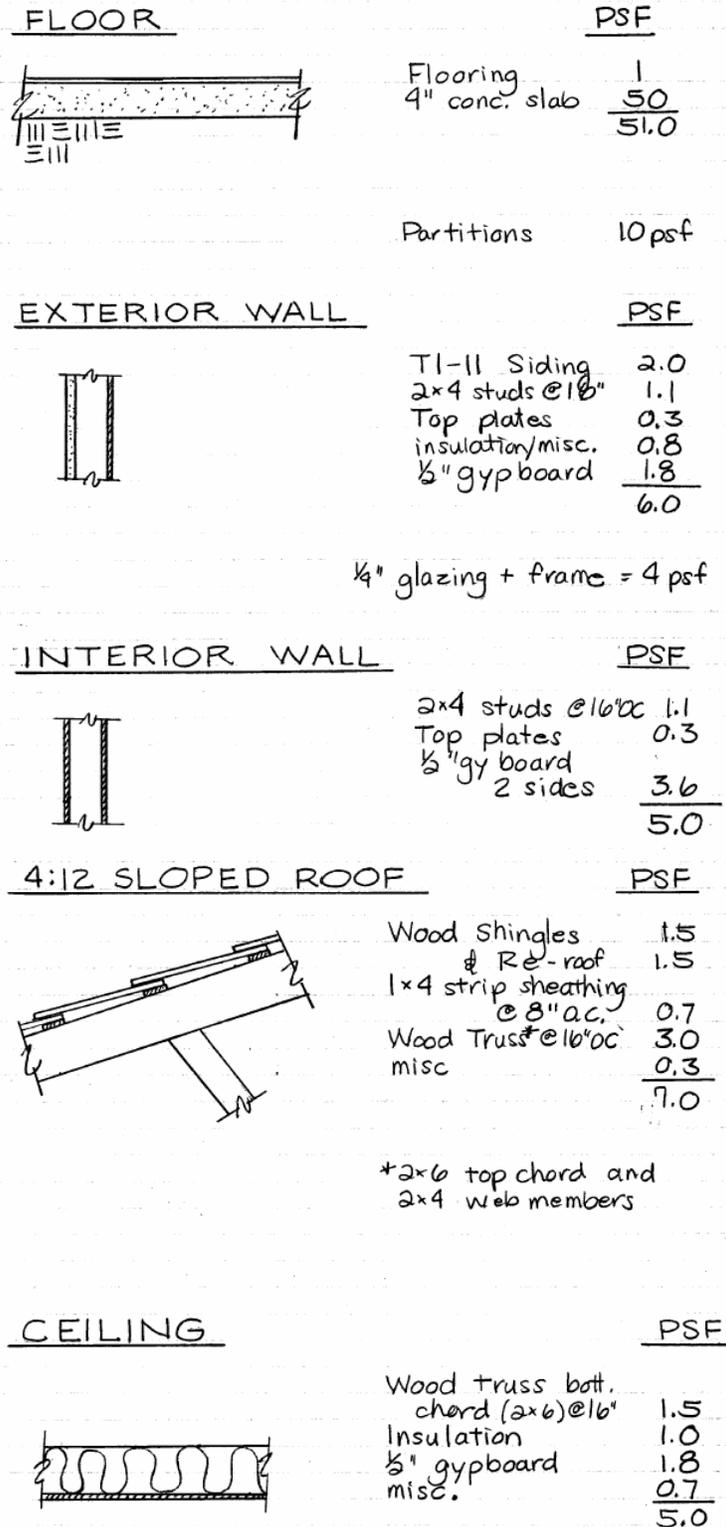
Index building 6 wall, floor, roof, and ceiling sections
